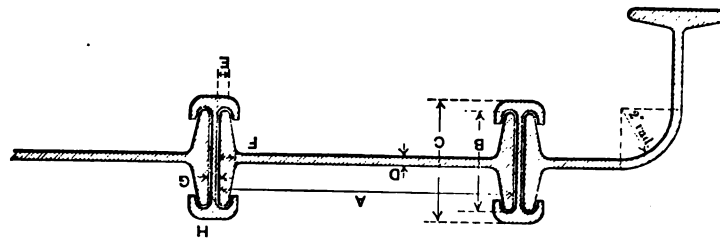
HAROLD'S STEEL SHEET-PILING.
